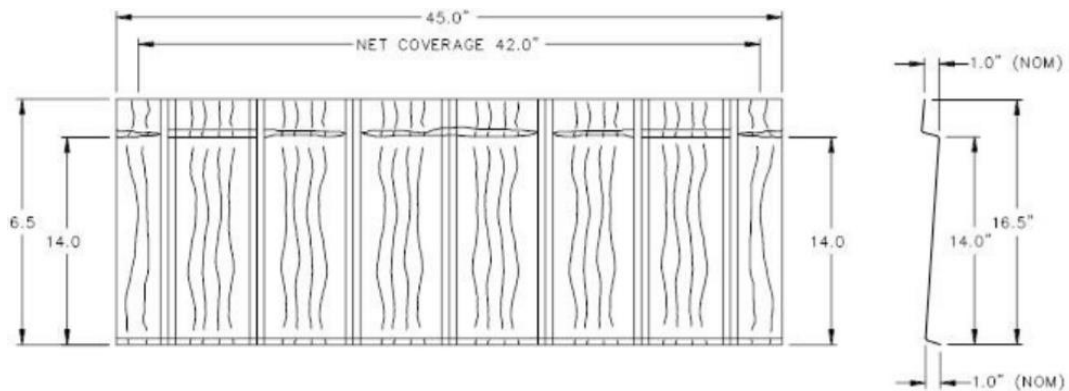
Detailed technical drawing of metal panels, showing dimensions, lap joints, and connections. Dimensions are in inches. (Drawing provided by Boral Steel)
